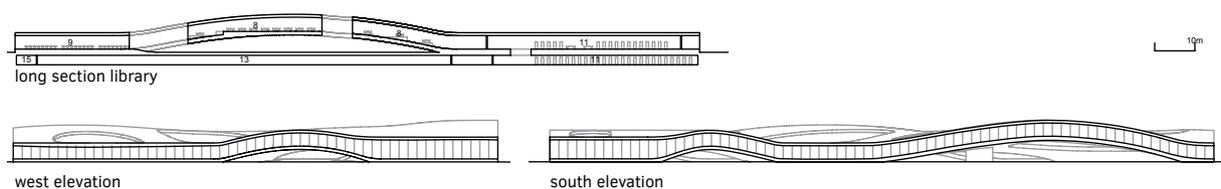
Learning Centre sections and elevations 1:1'000 (SANAA 2010)
